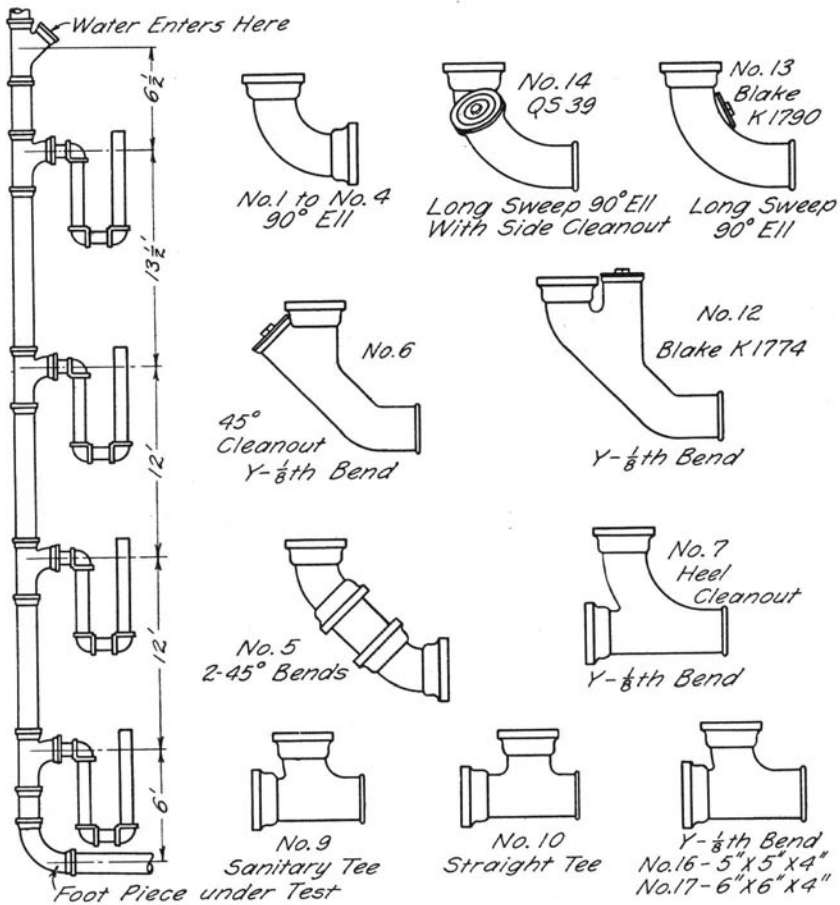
APPARATUS FOR TESTING CONNECTION OR FOOT PIECE BETWEEN STACK AND HOUSE DRAIN AND TYPES OF BASE CONNECTIONS OR FOOT PIECES
